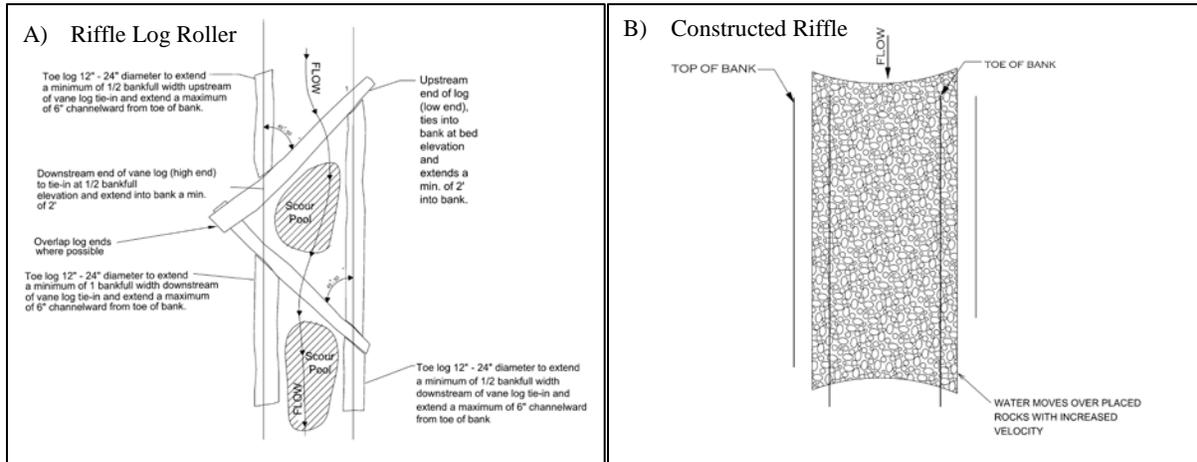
Plan views of A) Riffle Log Roller and B) Constructed Riffle
